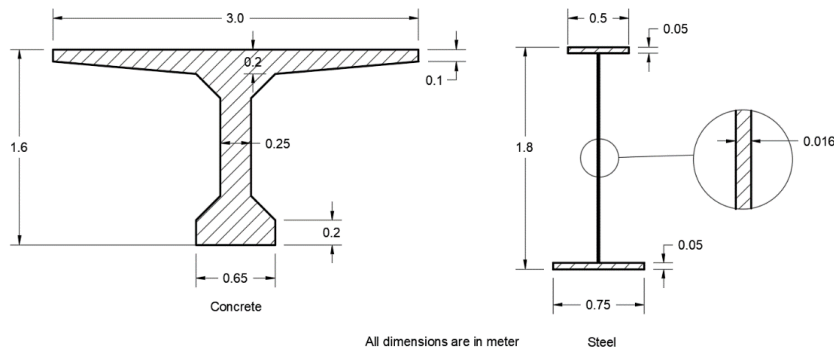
Cross-sectional and dimensional view of concrete and steel girder without confining concrete
